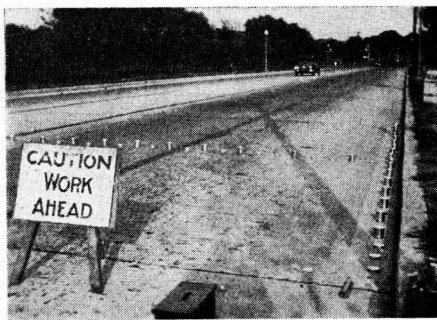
Plugs From Which Readings Were Made to Determine Movement of Pavement Slab
